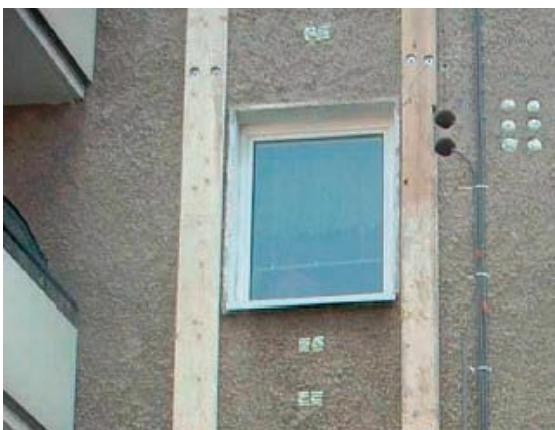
and 10 - Holes for the ventilation of the new façades (left) and the installation of the GAP-solar panels (right)
